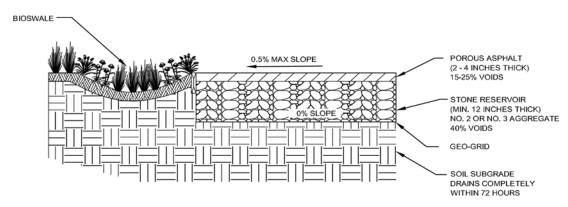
B. Porous Asphalt with Bioswale Outlet
